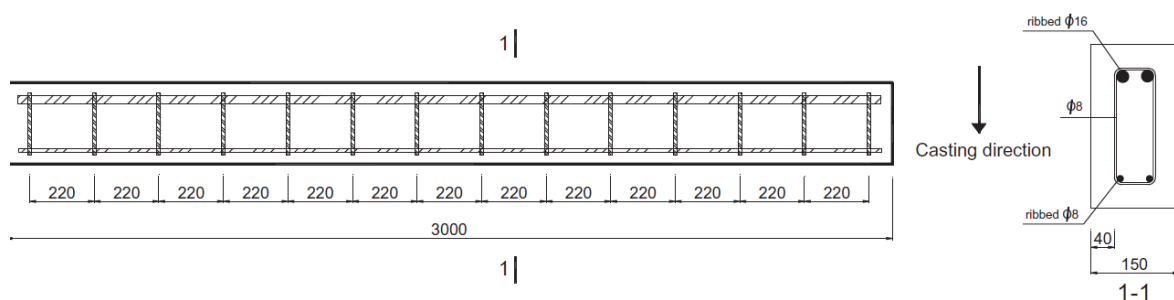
Layout of reinforced concrete beam type A (dimensions in mm) [19]
